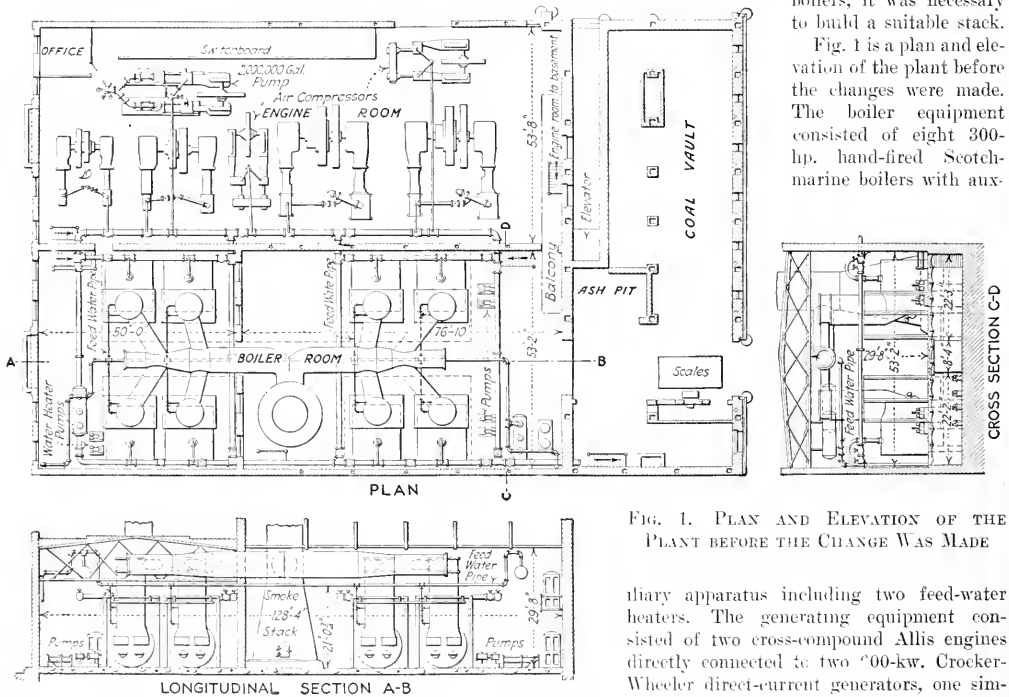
PLAN AND ELEVATION OF THE PLANT BEFORE THE CHANGE WAS MADE
